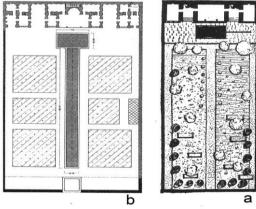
a) Haft-Tanan Plan (Wilber, 2004), b) Restoration plan of Divankhane garden
